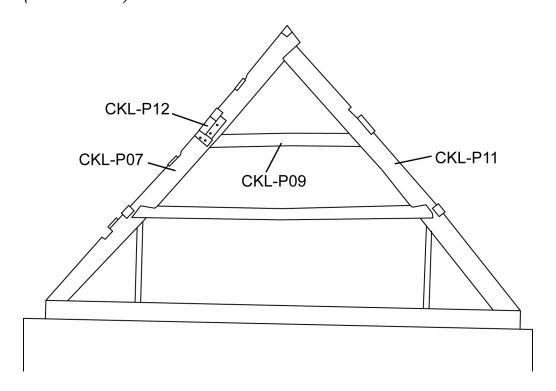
Truss 5 looking south, showing the location of samples CKL-P07, CKL-P09, CKL-P11, and CKL-P12 (after lan Wells)
